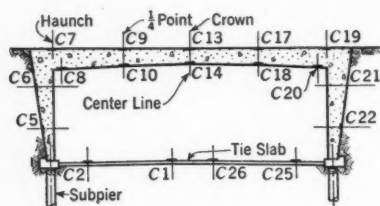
TYPICAL SECTION, SHOWING LOCATION OF STATIONS ALONG CENTER GIRDER
